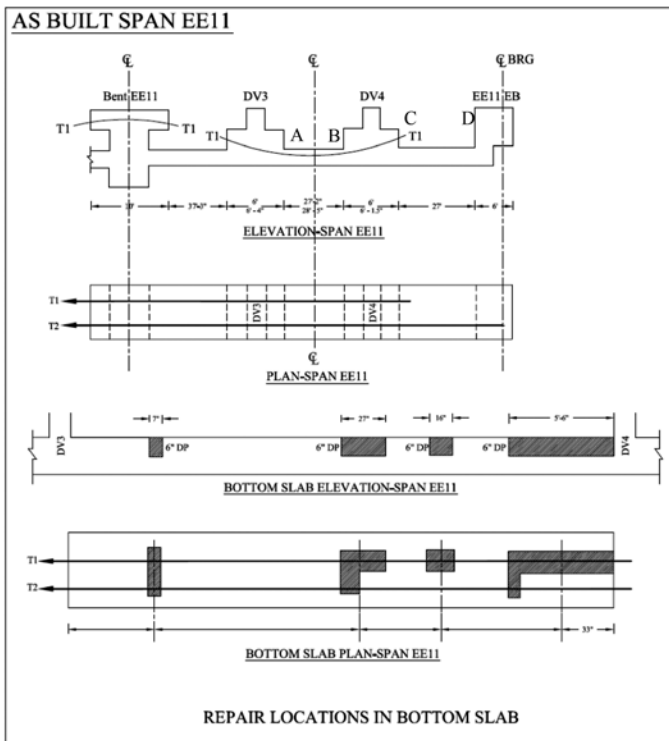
Repair locations in elevation and plan in thickened slab in Span EE11.
